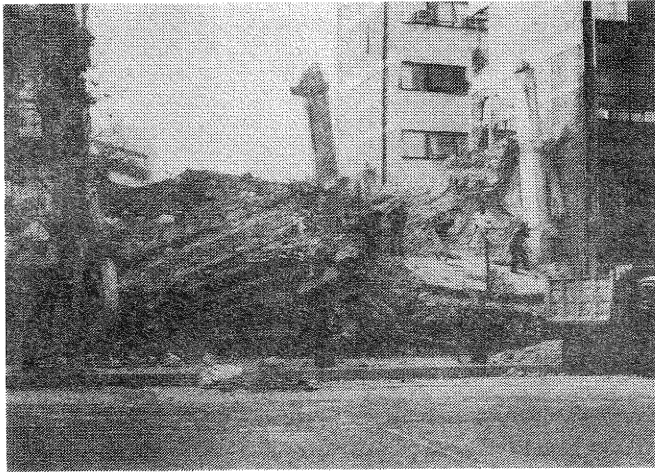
Flat slab failure in an eleven storey structure on Av. Oaxaca.
